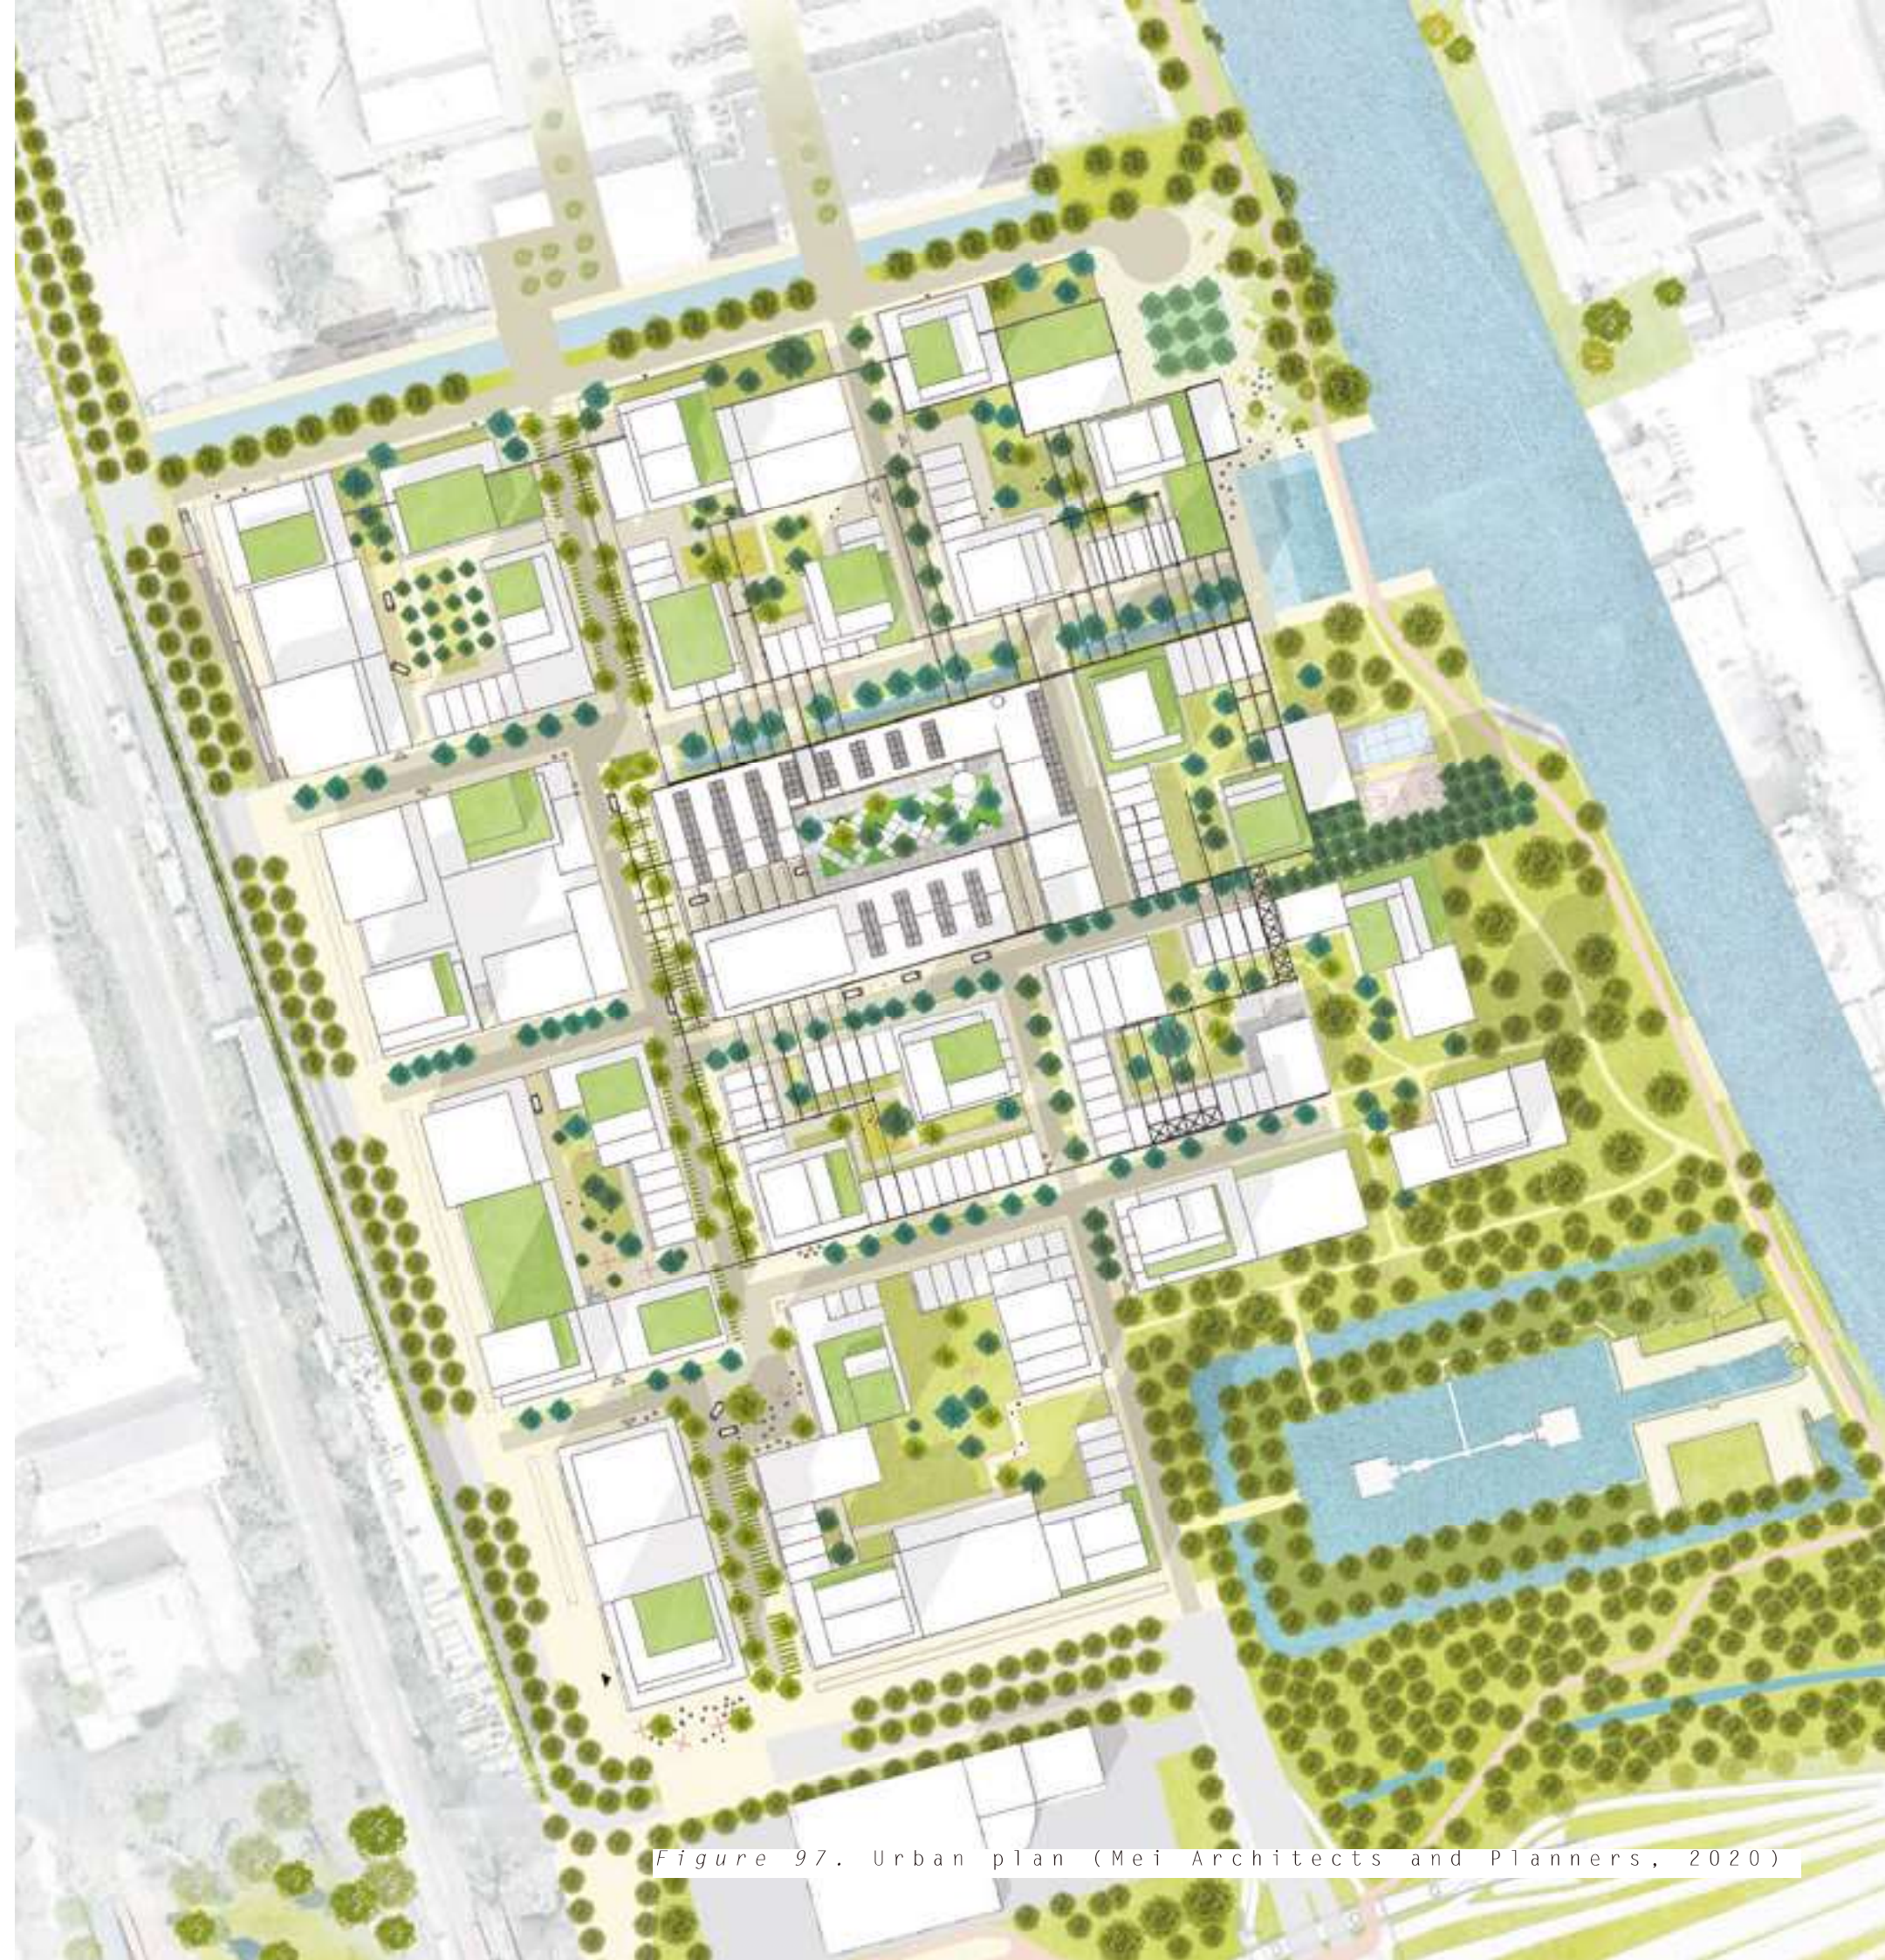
Urban plan (Mei Architects and Planners, 2020)
